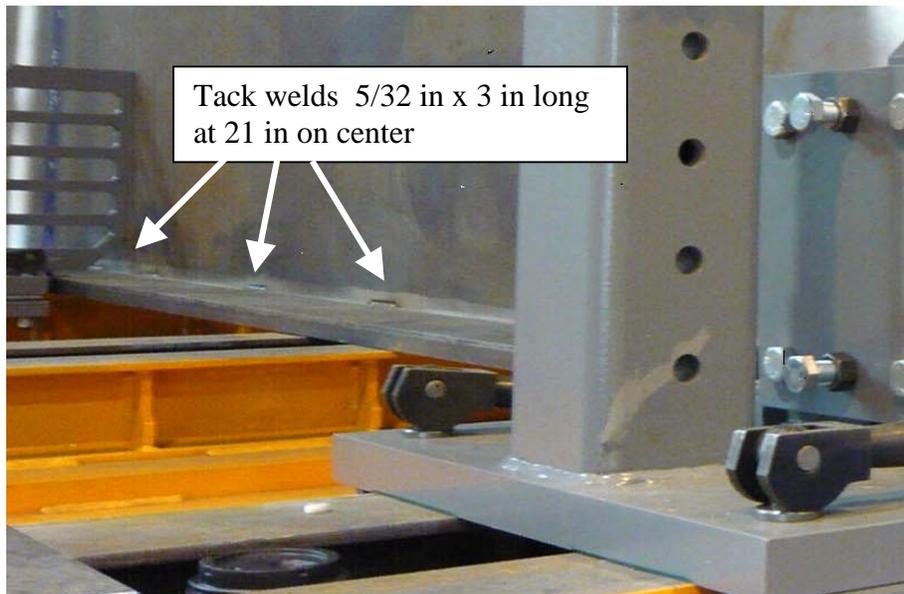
Tack welded full cross-sectional beam.
